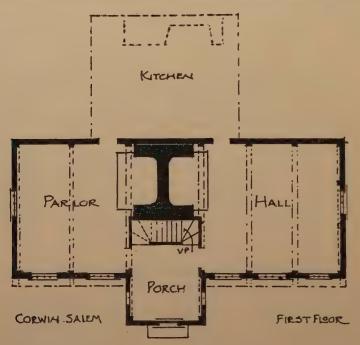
The Corwin House, Salem, Mass., Plan 1650-1675
